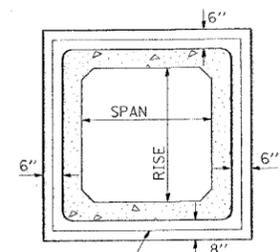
DETAILS OF CONCRETE COLLAR FOR PRECAST BOX CULVERT
